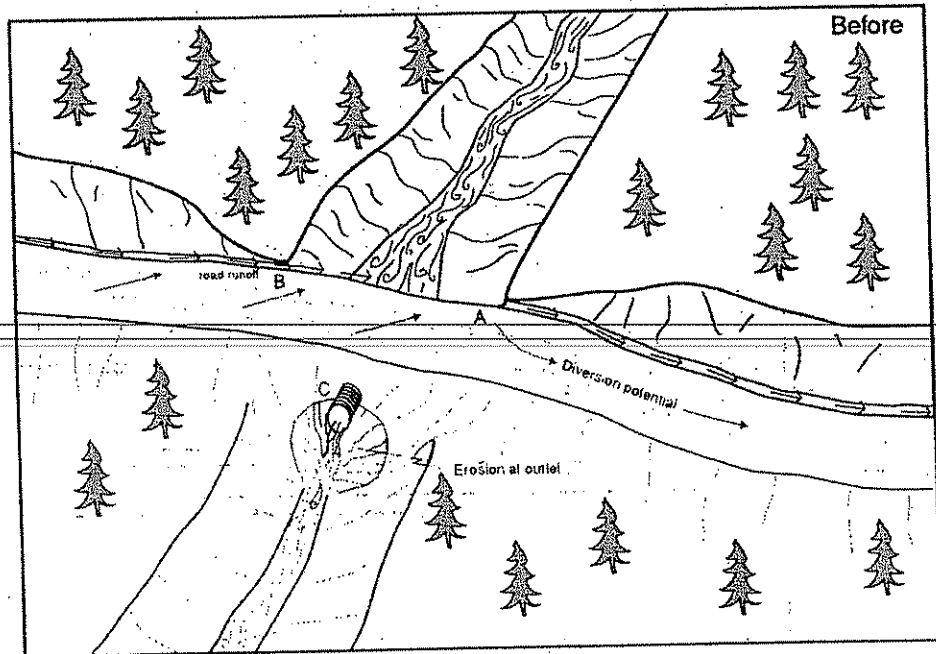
Typical stream crossing excavation on a decommissioned road.
